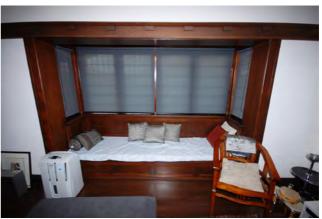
Timber joinery for the bay window in the Living room with plate rail above.
